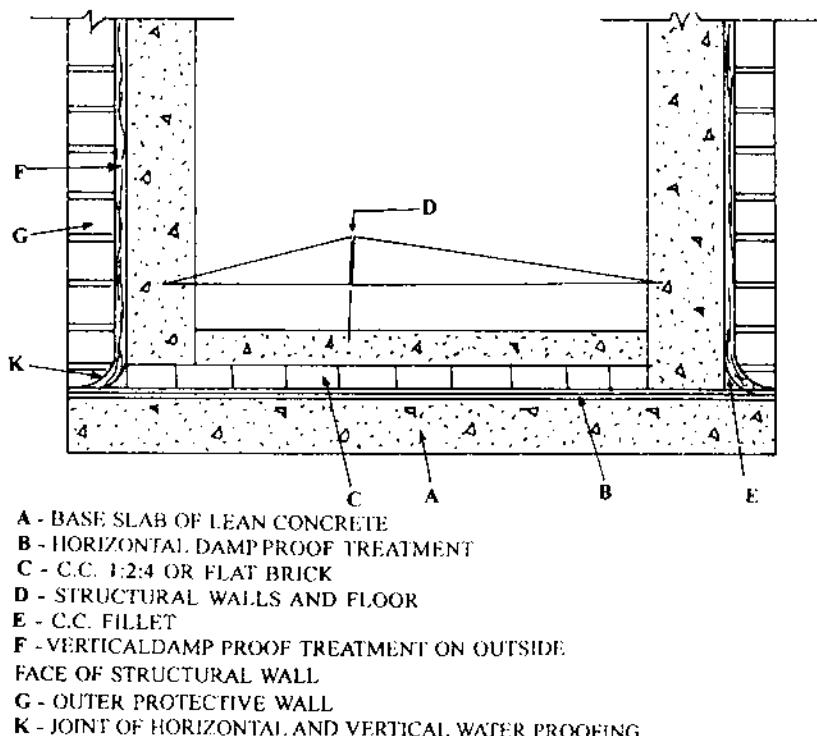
Damp proof treatment for basement with adequate outside space
